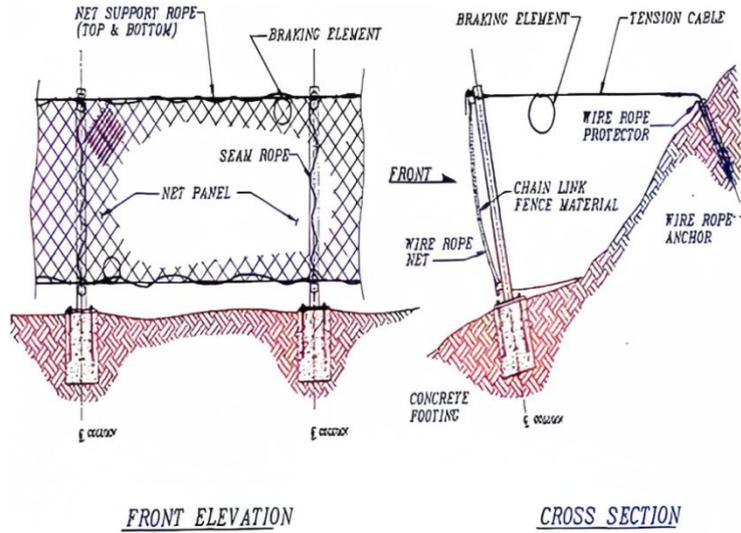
Typical Layout, Wire Rope Net Barrier System
